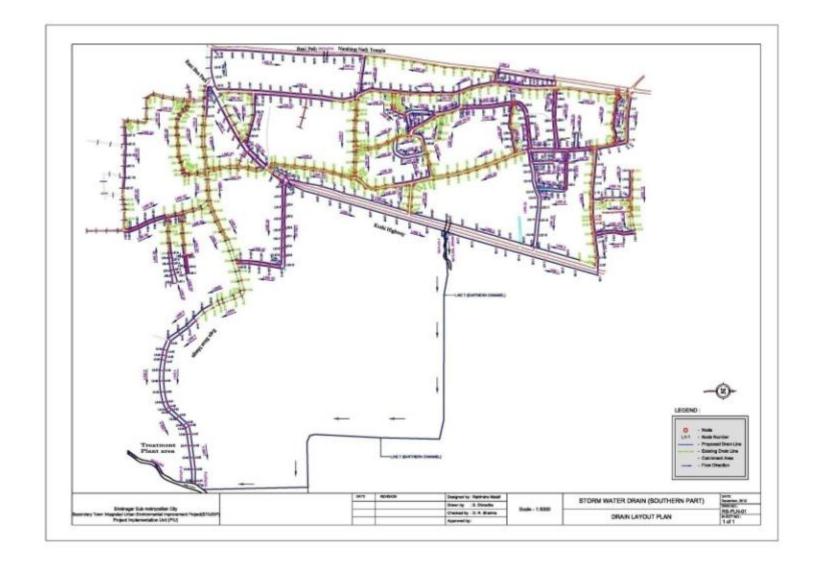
Proposed Storm Water Drains in BSMC (Southern Drainage System)
